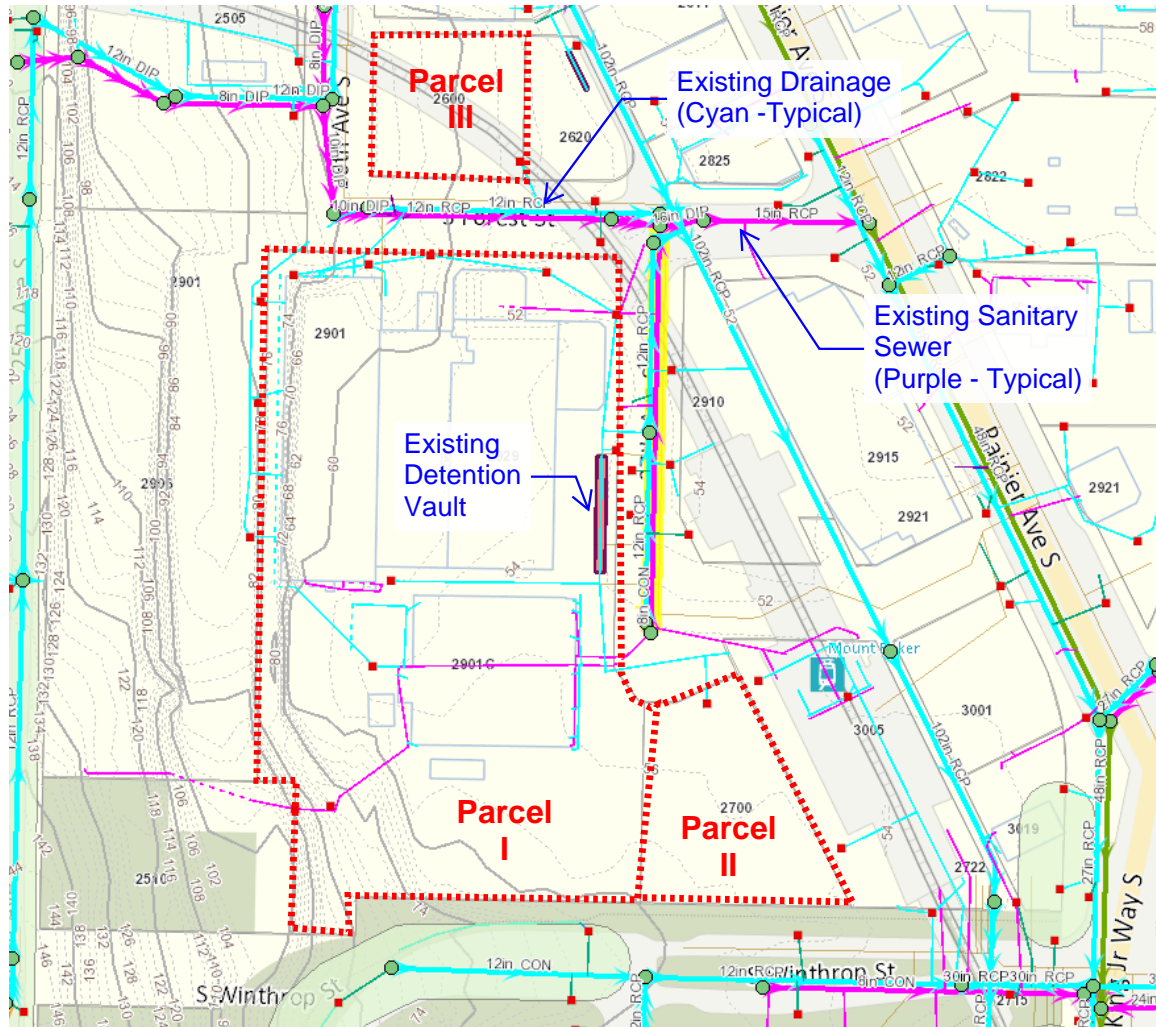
Existing Storm Drainage and Sanitary Sewer
